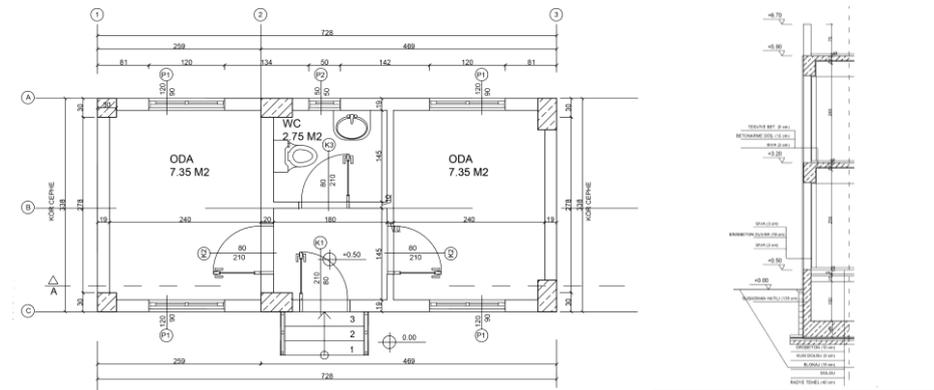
The Internship House Project Reinforced Concrete System Plan and Section
